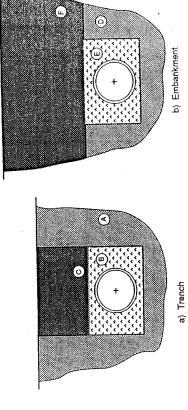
Pipe installation type. INSTALLATION TYPE The two basic plastic pipe installation type are shown in Fig. 1. The trench case (Fig. 1a) represents a situation in which the existing ground (zone A) is excavated to the depth required for pipe installation. The resulting trench is backfilled with two zones of compacted soil. Zone B is the zone immediately surrounding the pipe which requires certain restrictions on the placement and compaction to wroid distressing the pipe, and restrictions on the type of soil to provide needed stiffness and stability. The remainder of the trench (zone C) is usually filled with the excavated soil appropriately placed and compacted. The specific trench dimensions as well as the dividing line between zones B and C depend on the requirements of the installation. The embankment case (Fig. 1b) shows the pipe installed in a shallow trench excavated in the existing ground (zone D) and backfilled with zone E material meeting requirements similar to those of zone B. An earth embankment (zone F) is then constructed on top of the existing ground. This configuration is known as a negative projecting embankment pipe installation [1]. The pipe may also be installed above the existing ground, in which case zone E is laterally supported by embankment soil in zone F rather than by existing ground.
